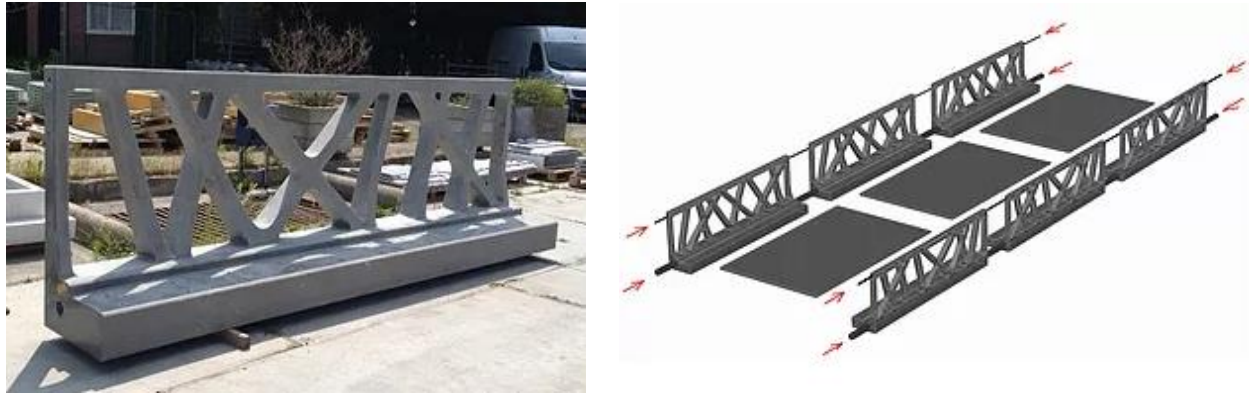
Railing module loose from the assembly (left) and an exploded view of the segmental assembly (right) (FDN Group)
